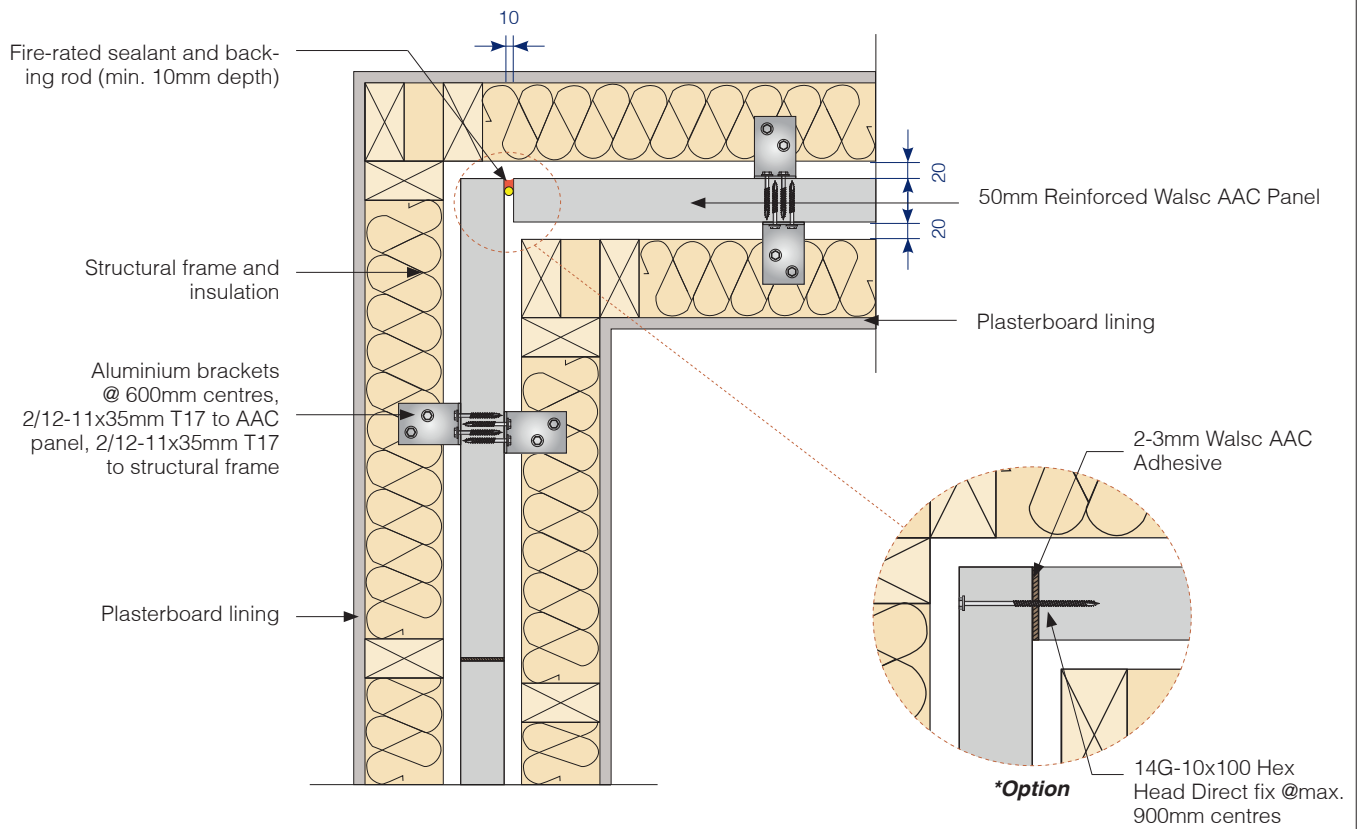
Vertically Aligned System Corner Vertical Control Joint
